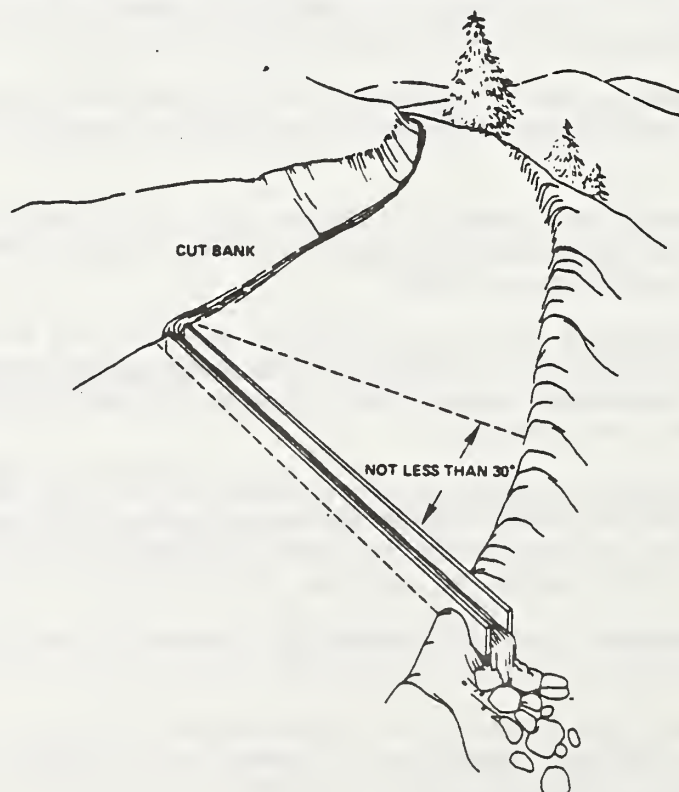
Installation of an open-top culvert. Culverts should be slanted at least 30° downslope to help prevent plugging.
